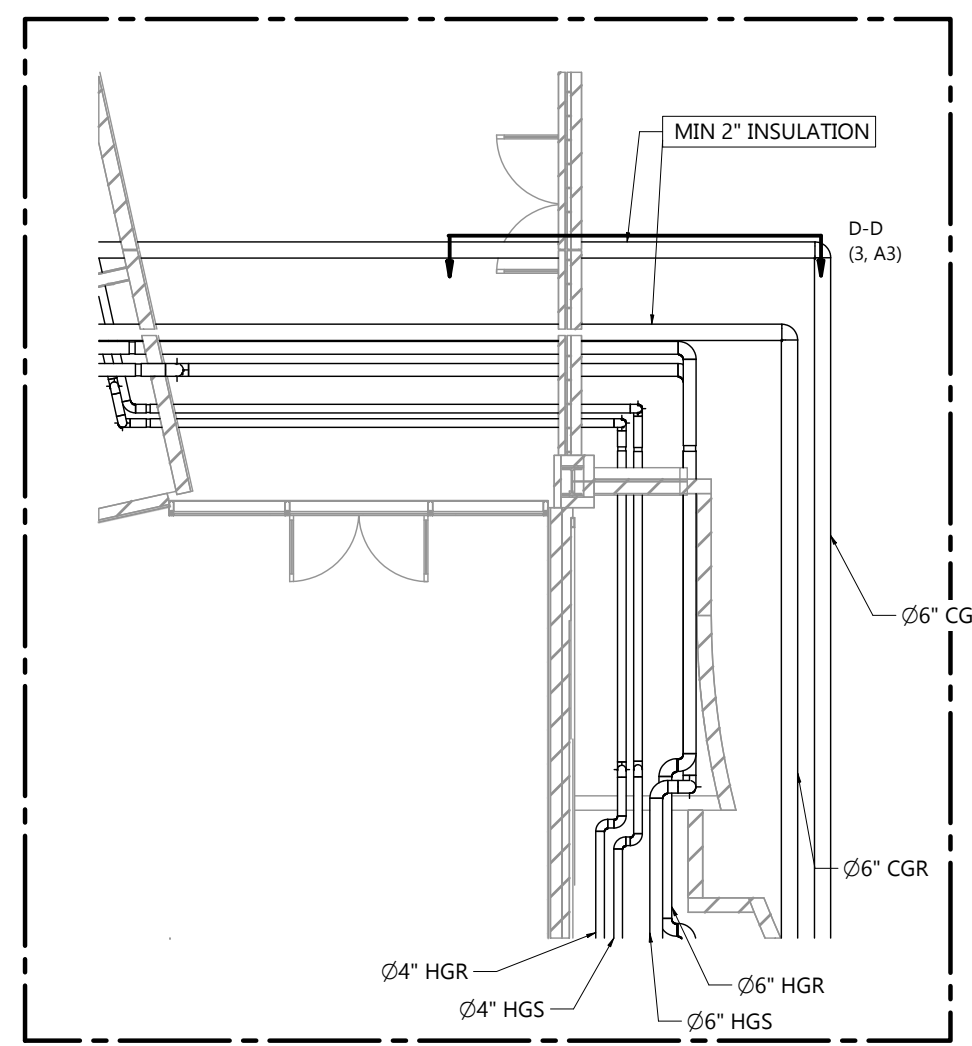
, B2): WARM PIPING FC-9 & FC-10
